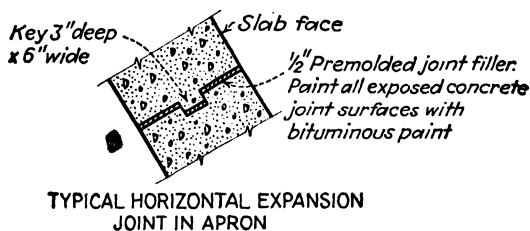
Possum Kingdom Dam. Apron expansion joint.
